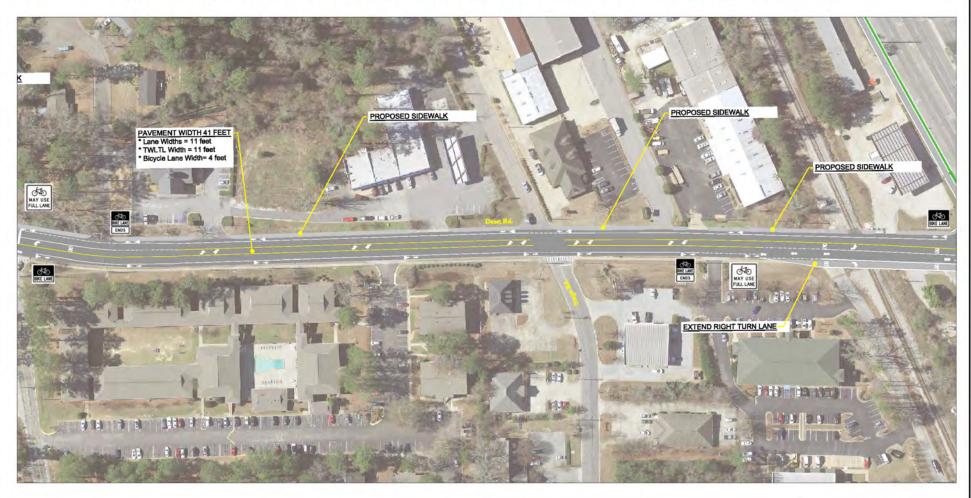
Dean Road at Stage Road Dean Road Auburn, Alabama
